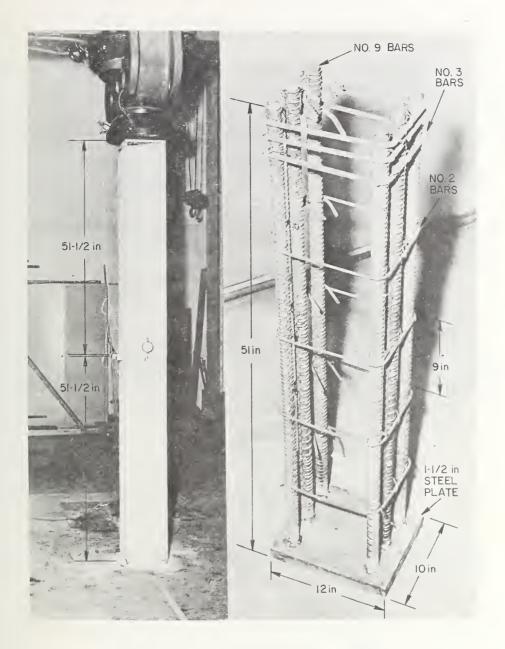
Specimen Used in Phase II Column Connection Tests
